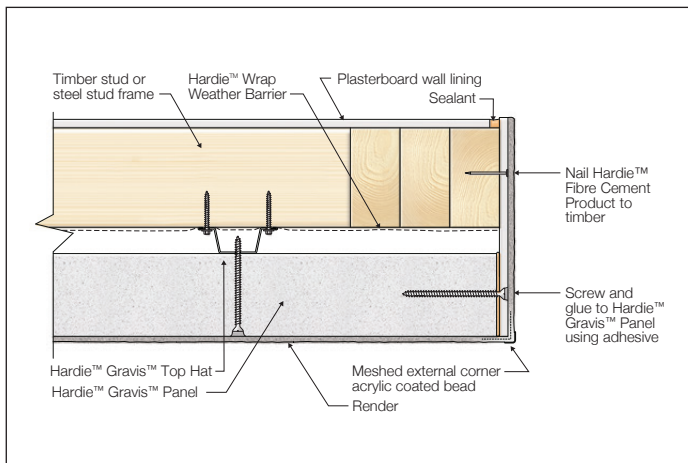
GARAGE DOOR JAMB DETAIL - OPTION 2
